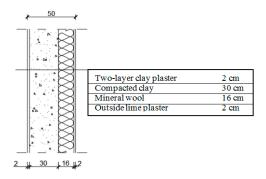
Cross-section of the wall made of clay compacted in formwork. Source: own.
